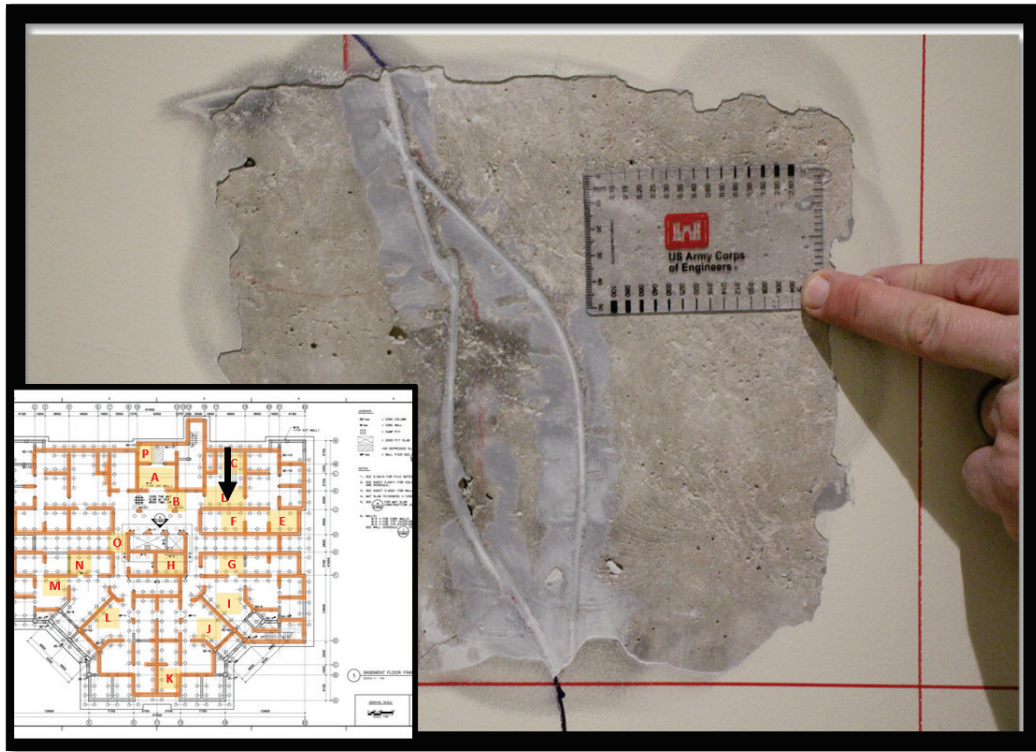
Wall cracks within the Tower 2 basement storage area (Section D of the floorplan insert). The widest observed crack width was less than 0.50 mm (crack gauge insert). The shown cracks were traced with a permanent marker to highlight typical locations, lengths, and spacing and are not representative of crack width.
